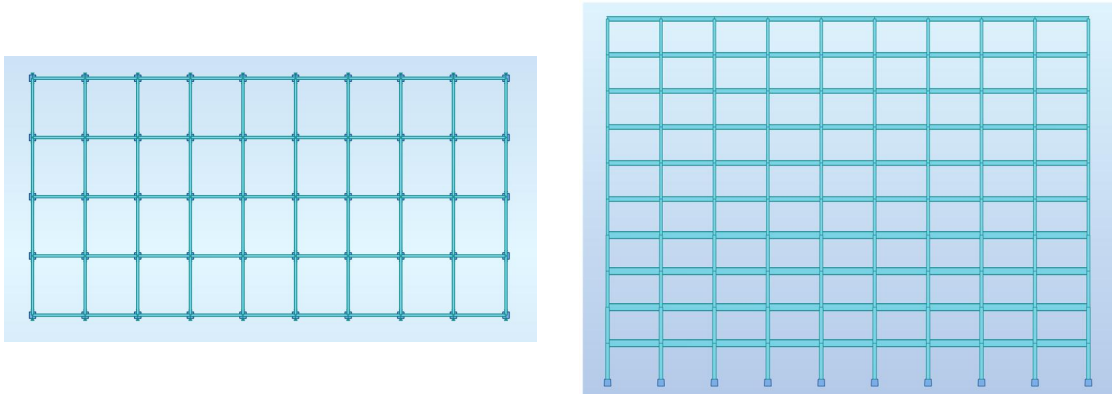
Plan (left) and elevation (right) view of the 9x4 layout
